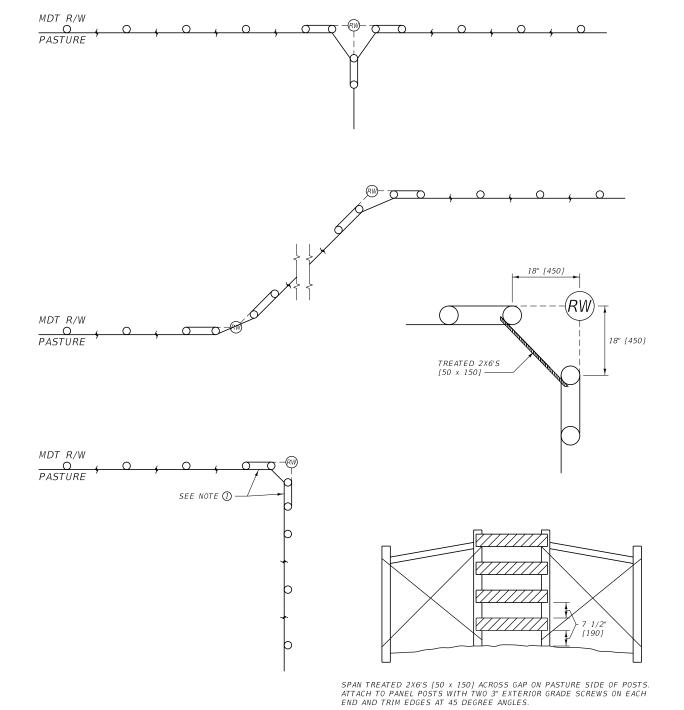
DETAILED DRAWING REFERENCE DWG. NO. STANDARD SPEC SECTION 607 607-15
